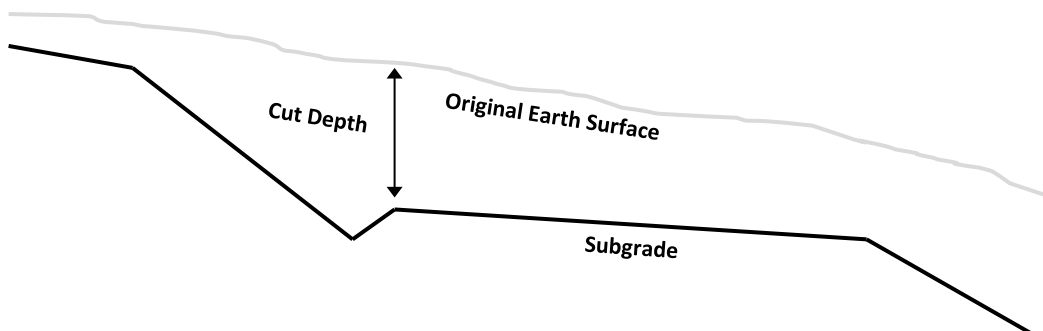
Typical Cross-Section for Roadway Cut Section
